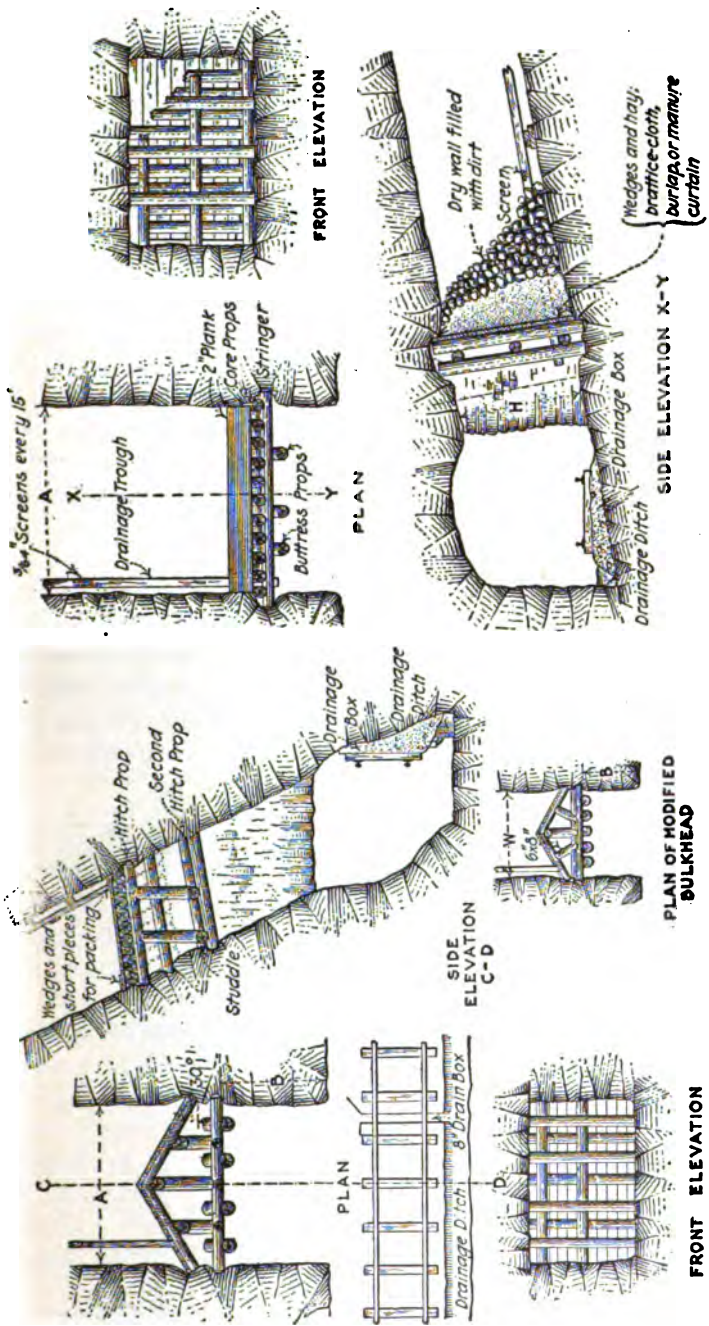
Construction of mine bulkheads. (U. S. Bureau of Mines.)
